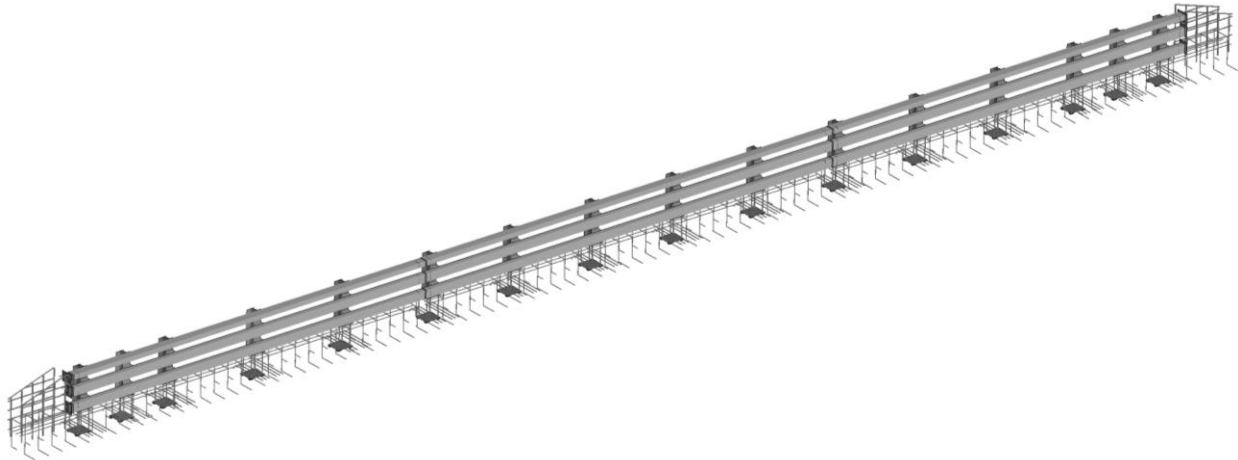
Steel reinforcement bars in the concrete foundation and end parapets of the Oregon Rail.
